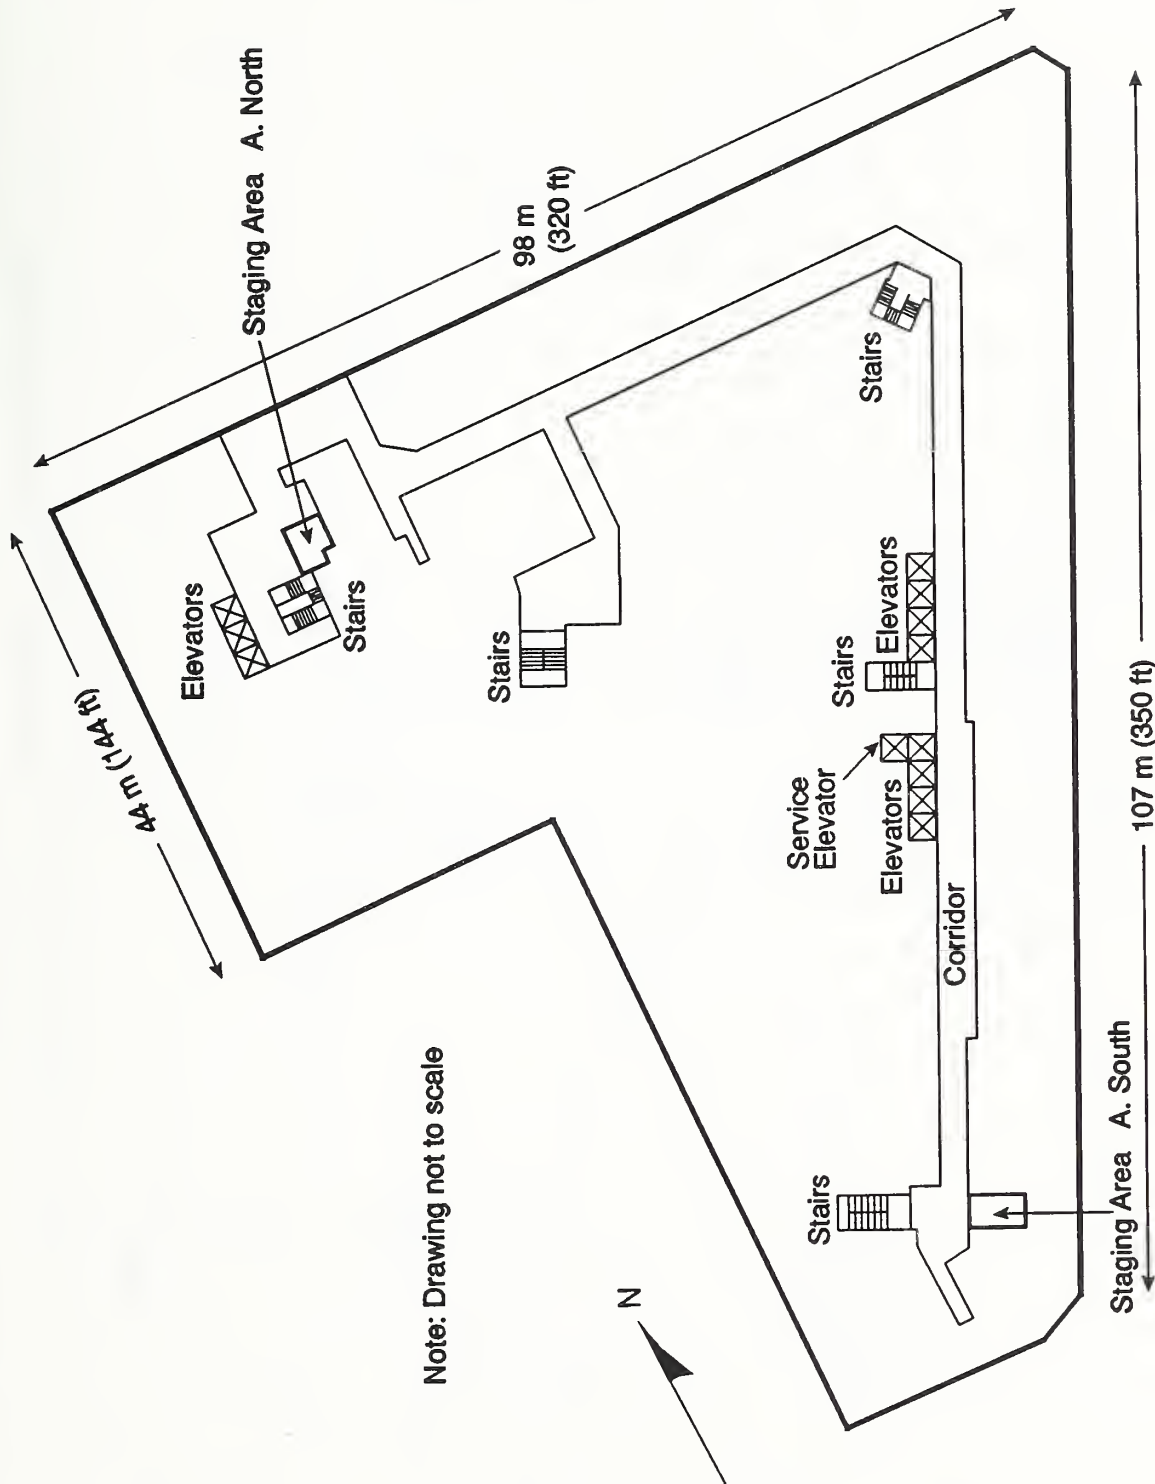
Basement A plan of the Department of Veterans Affairs Building
